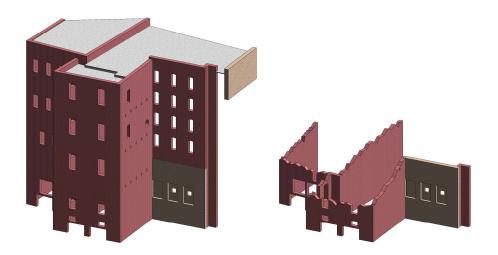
Model of Existing Station No. 4 (left) and Potential Remnant (right)
